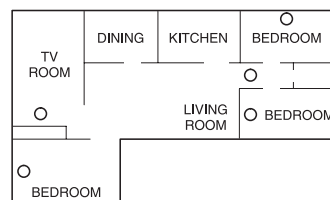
Location of the Detectors in dwelling units with more than one bedroom area or with bedrooms on more than one floor.
